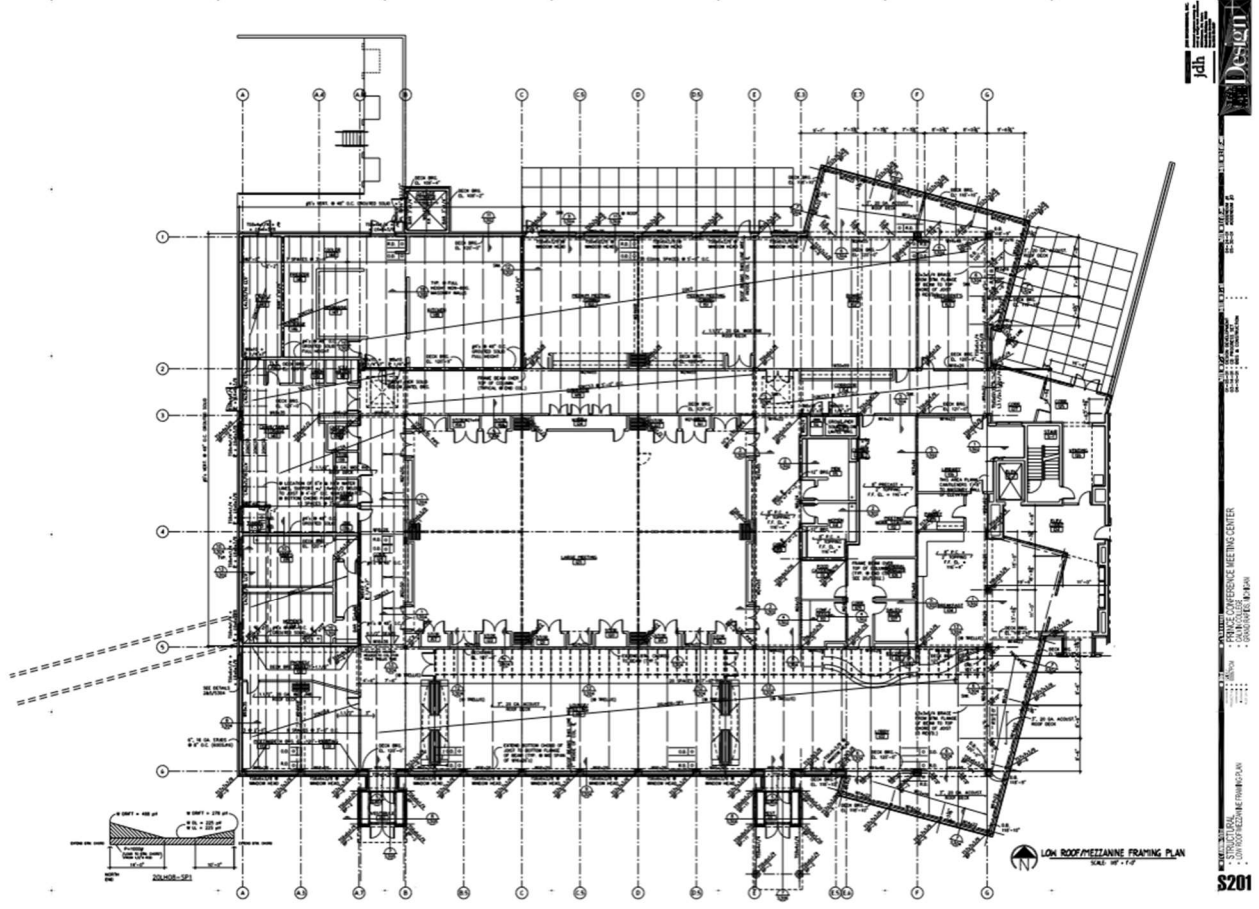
Prince Conference Center Roof 1 Framing Plan.
